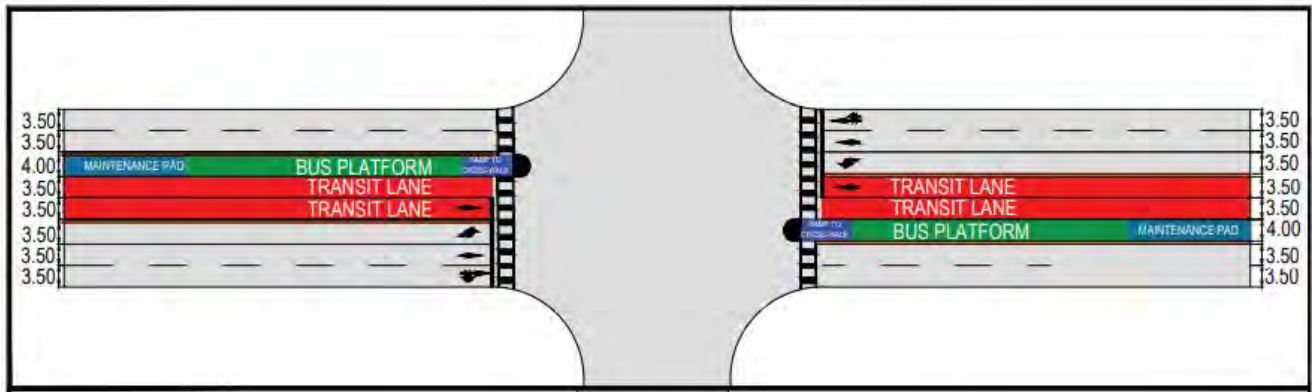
Dundas Connects Master Plan- Dundas Bus Rapid Transit Line
